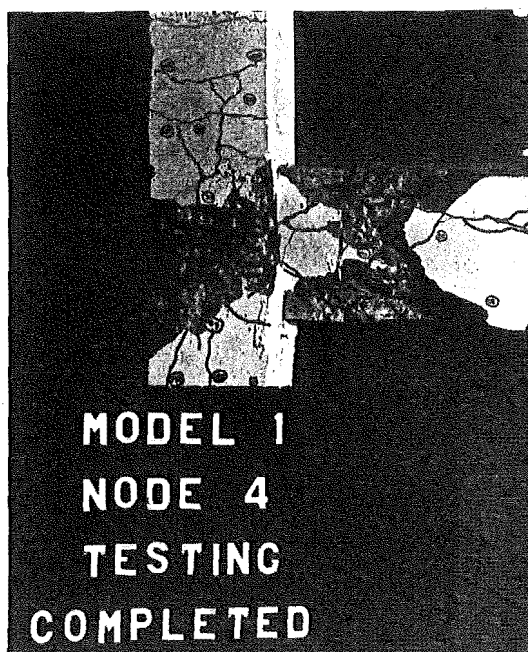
COVER CONCRETE IN A SMALL SCALE SIX STOREY FRAME SPALLED DUE TO TORSIONAL DEFORMATIONS IN A BEAM PERPENDICULAR TO THE DIRECTION OF LOADING (100).
